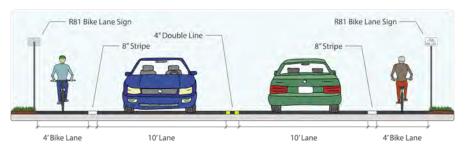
Class II - Buffered Bike Lane Without Curb and Gutter or Parking
